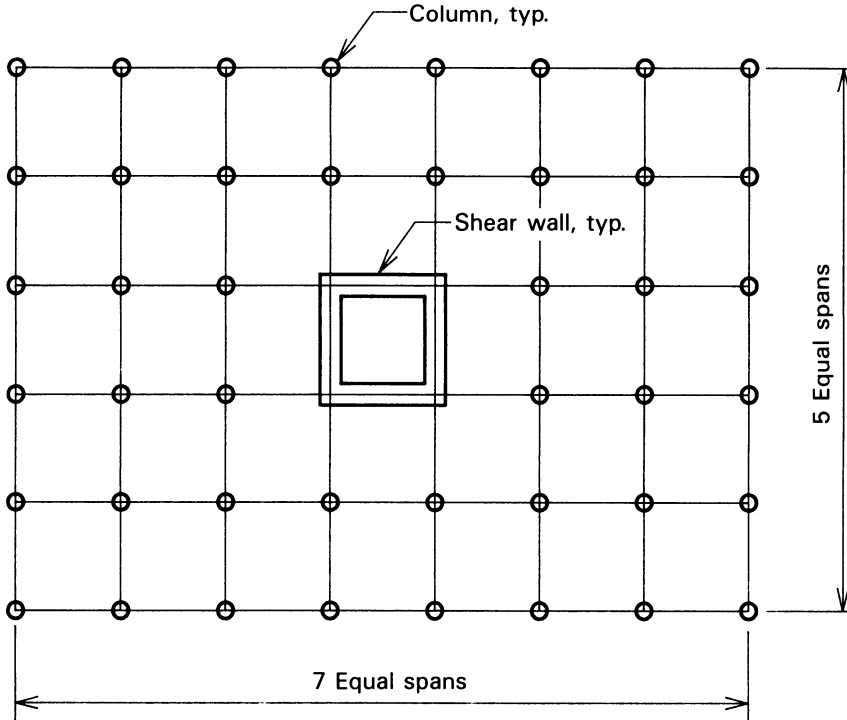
Plan of a building with a prestressed-concrete roof and shear-resisting walls in a core near the center of the structure.
